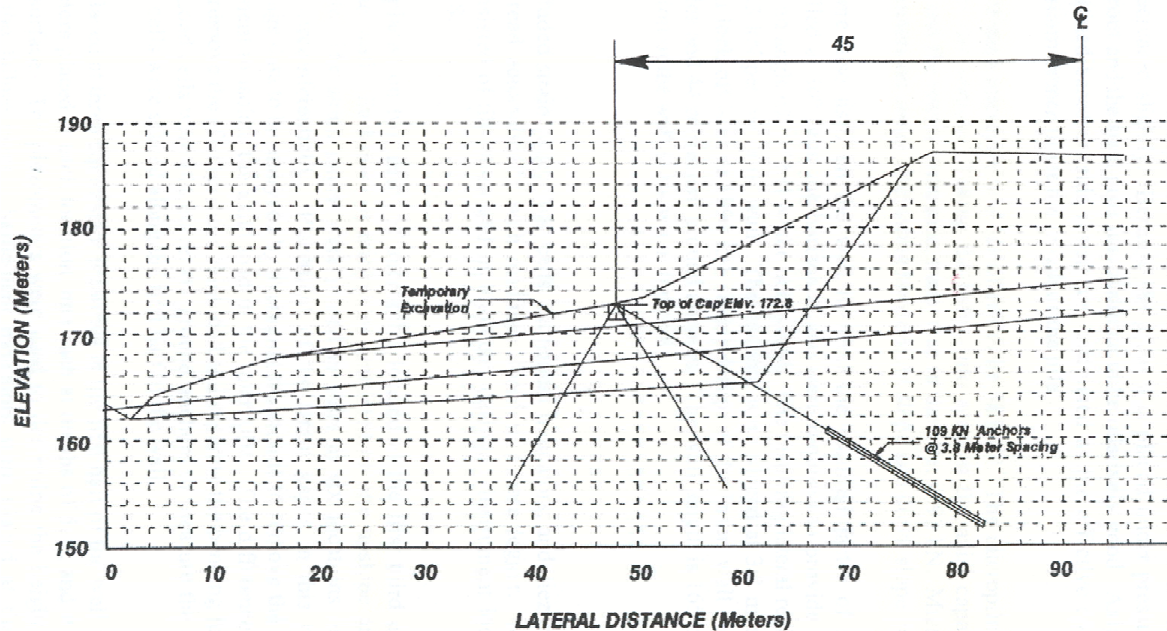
Typical Section of Micropile and Anchor Wall at Littleville, Alabama (after Brown and Chancellor, 1997).
